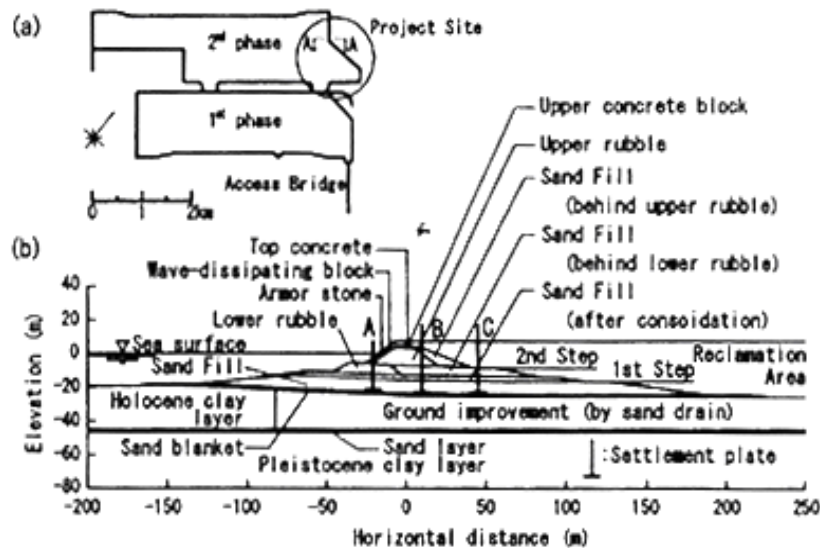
Plan of KIA, location of project and typical cross section of seawall (after Fukusawa et al. 2003)
